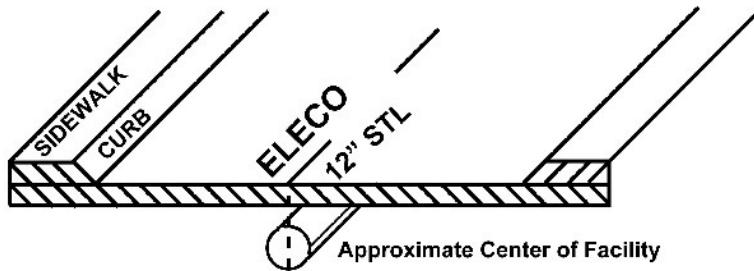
Single Facility Marking Over the Approximate Center of the Facility
